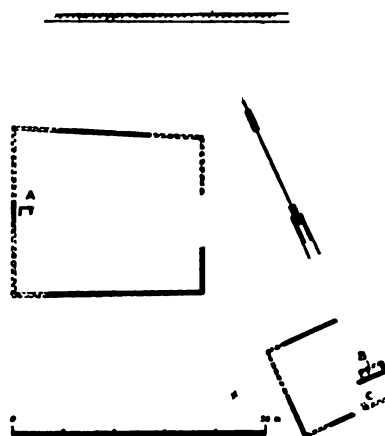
Plan of the site K 797 (Mamin-tsanghane-baishing).
